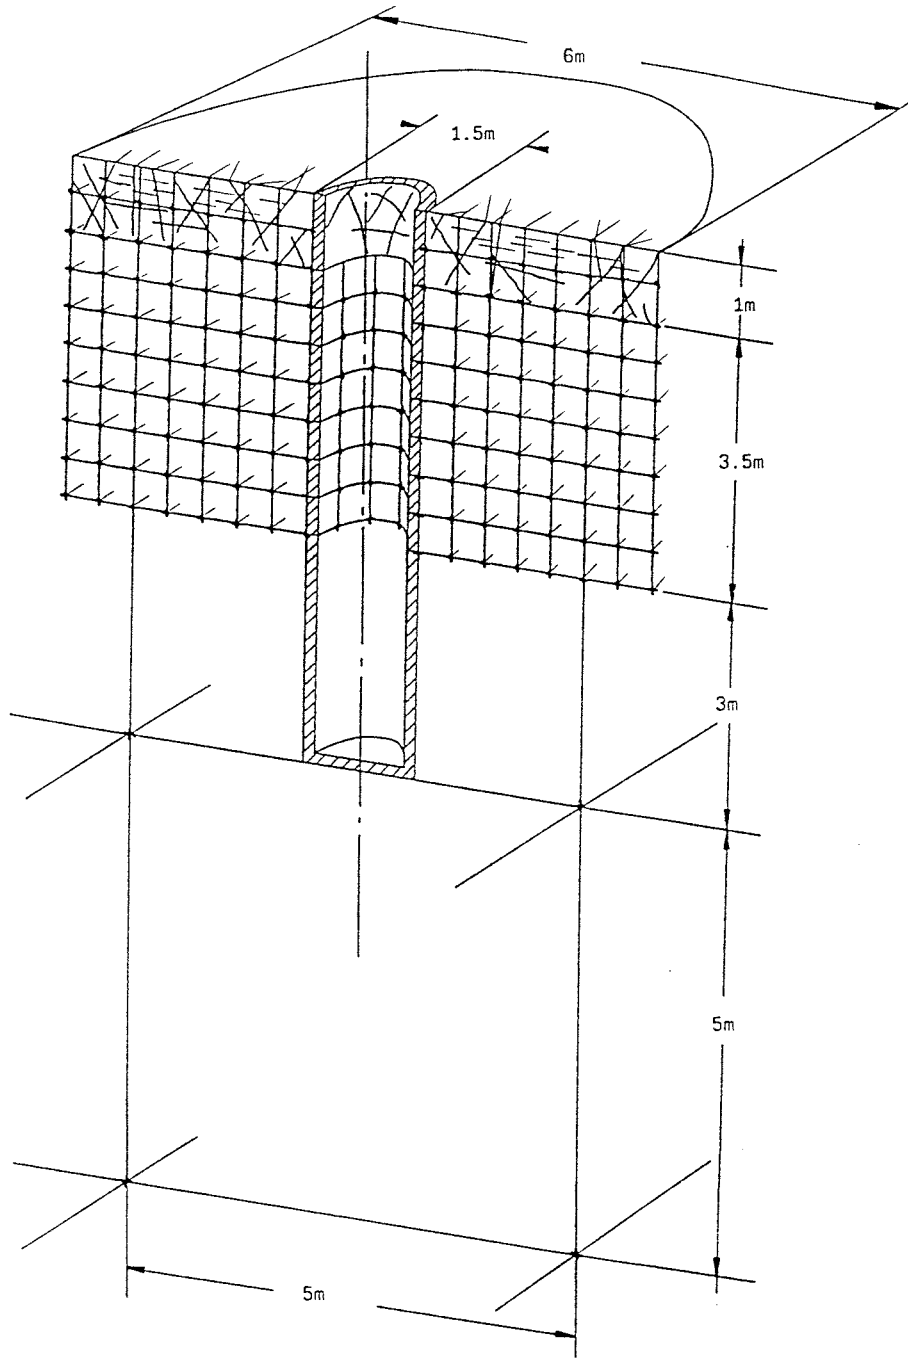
Cross section of KBS3 tunnel, "conservative" case
